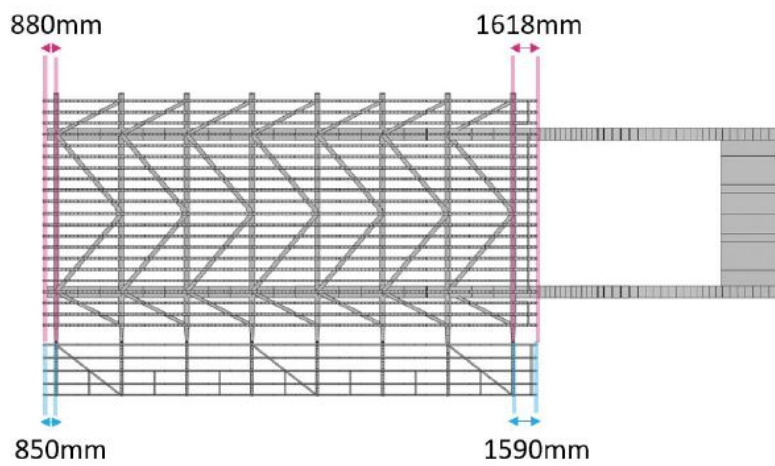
Cantilever distance of longitudinal girders (Arup bv)
